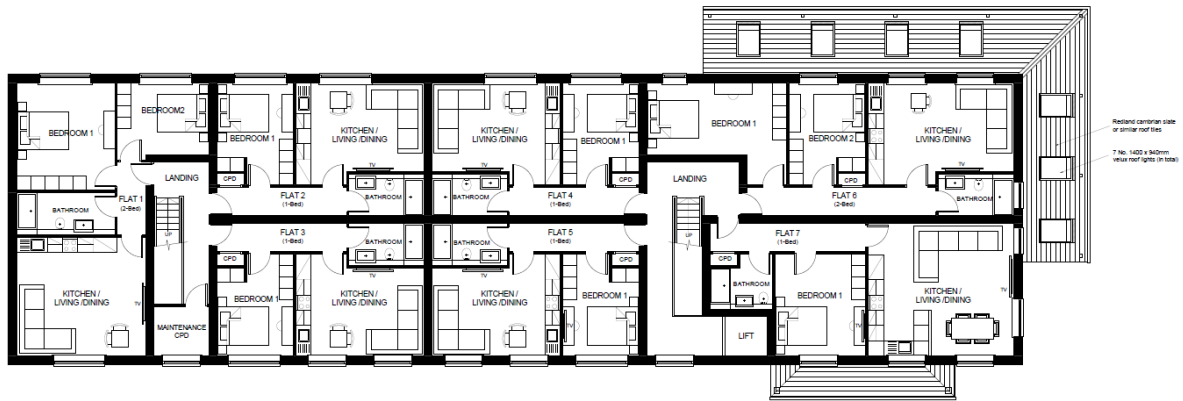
Excerpt from 01823-SK-01 showing the First Floor Plan
